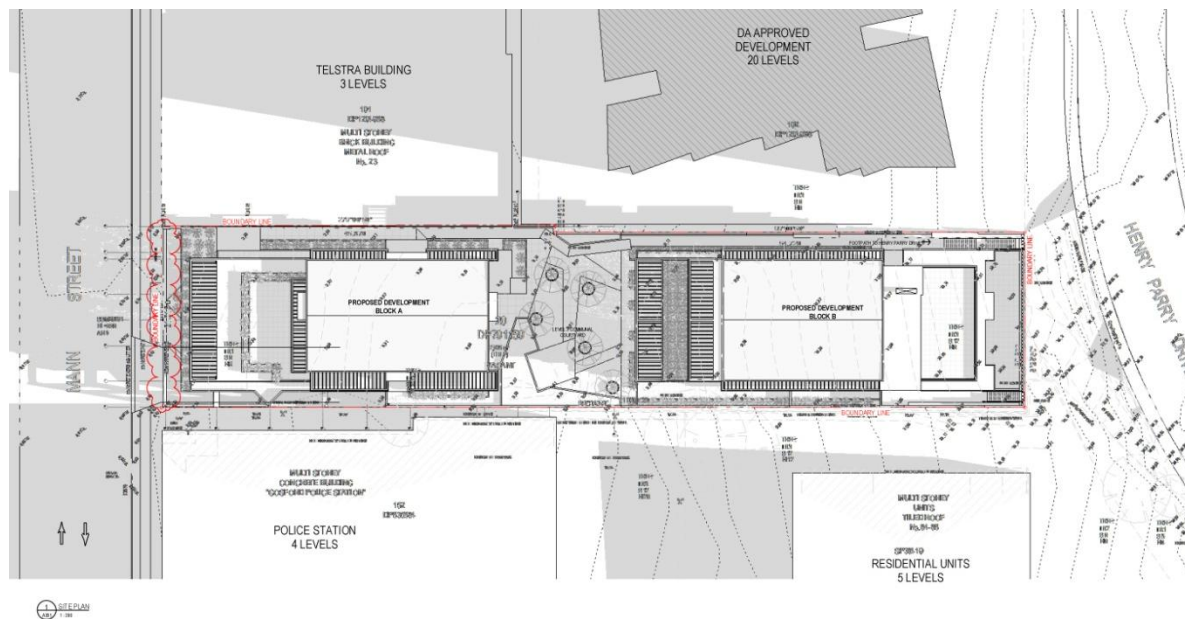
17 Mann Street DA Submission, Layout Plan (source Gosford Council web site)
